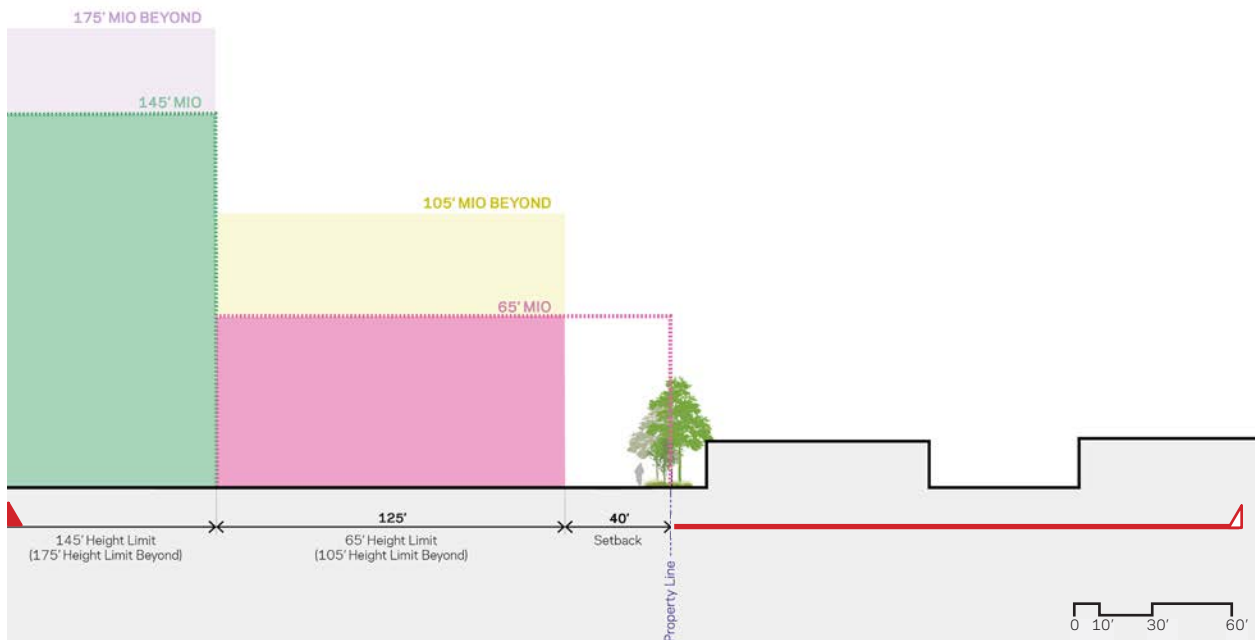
SECTION A: PROPOSED HEIGHTS & SETBACKS AT NORTHWEST CAMPUS EDGE
